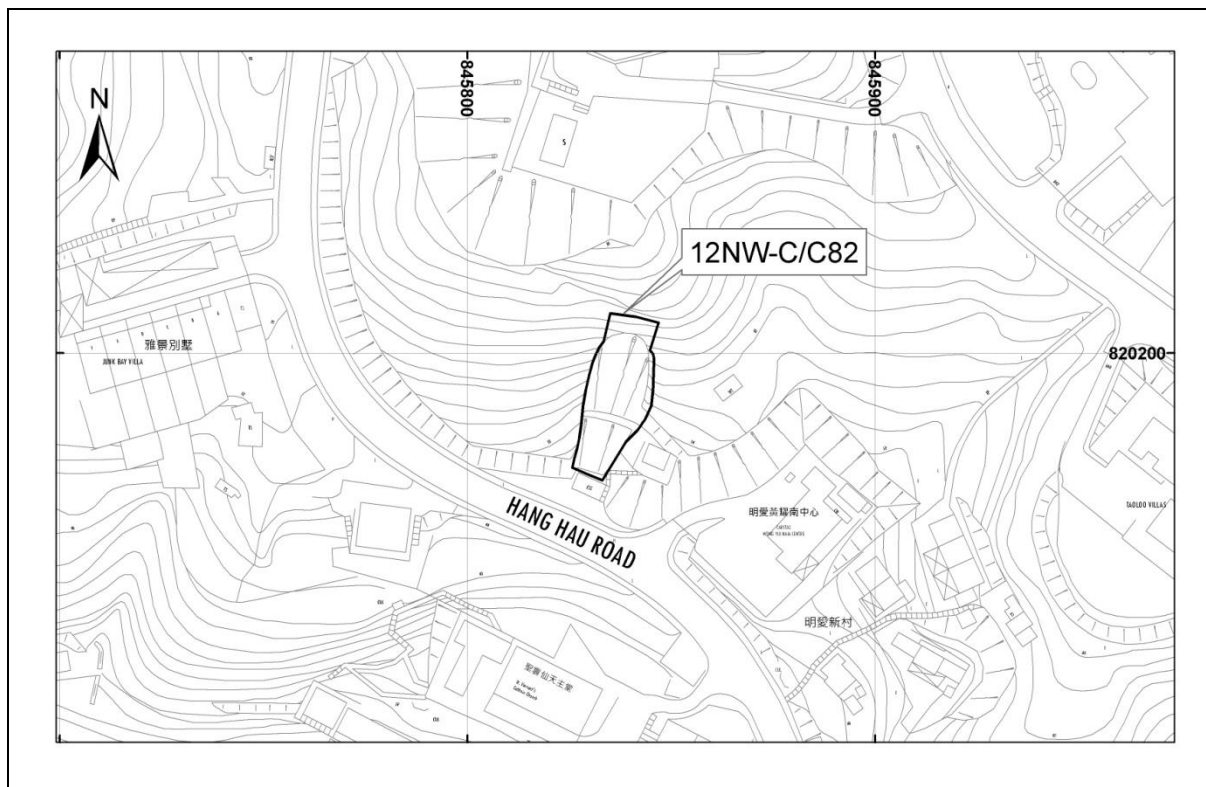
Location Plan of Slope No. 12NW-C/C82 at Hang Hau Road
